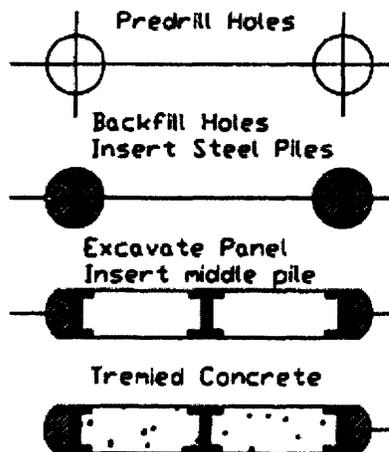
, Construction Sequence SPTC (Konstantakos 2000)
